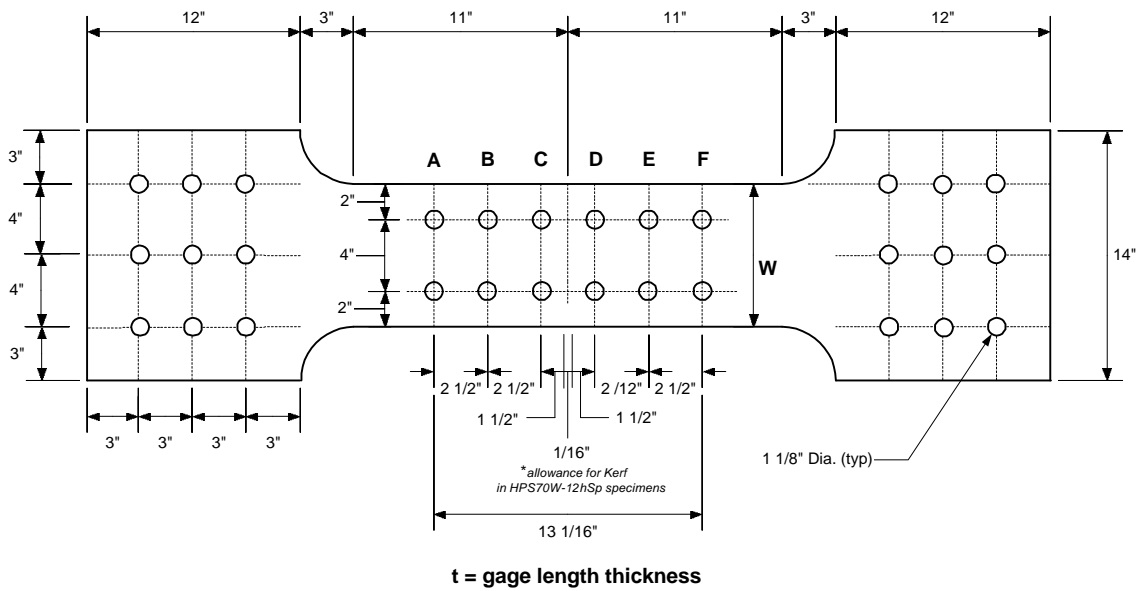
HPS70W 12-Hole Net-Section Specimen
